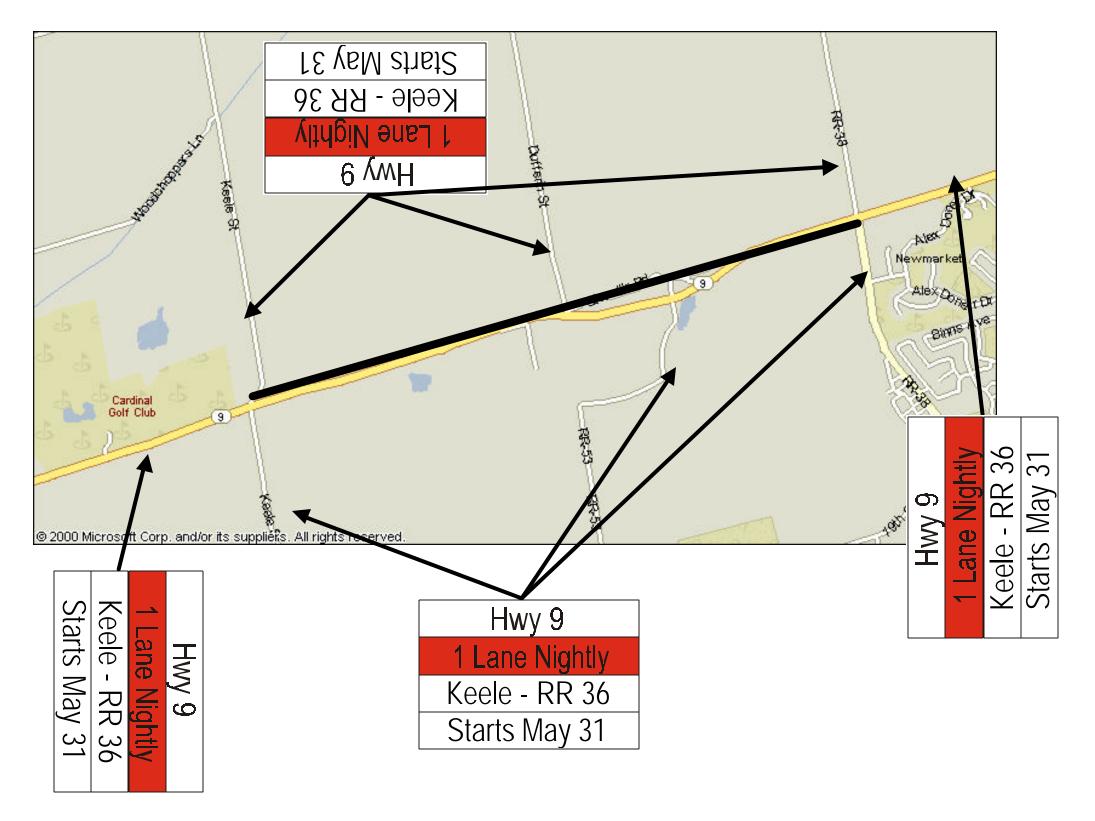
Highway 9 Reconstruction – Advance Notification Signing (ANS)
